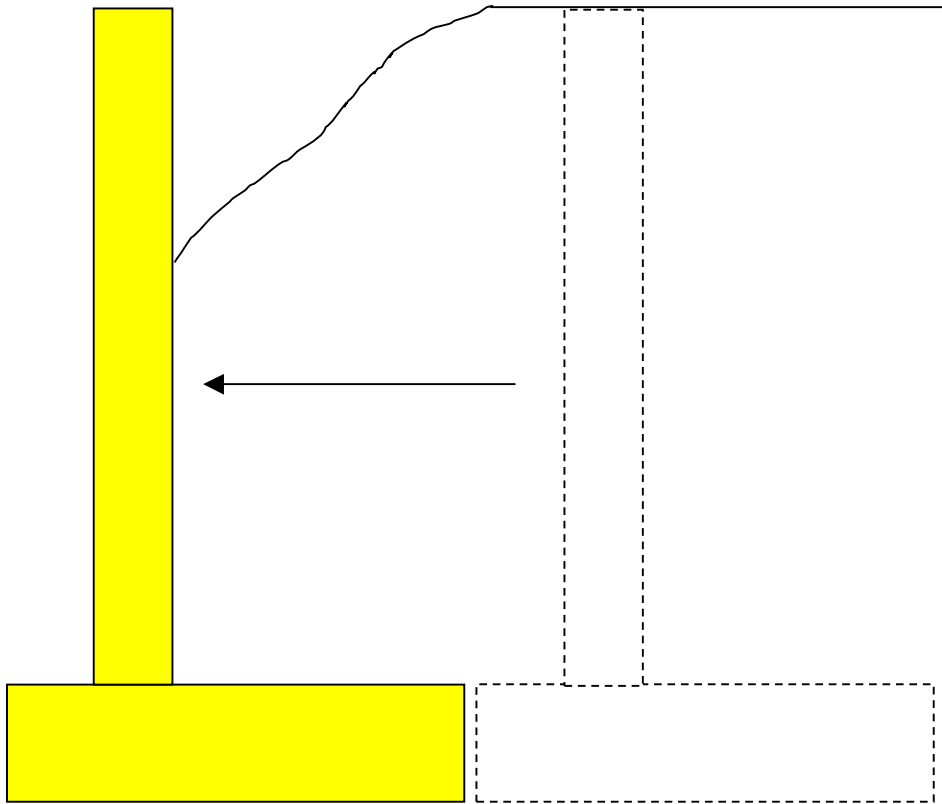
Sliding Failure of Cantilever Retaining Wall
